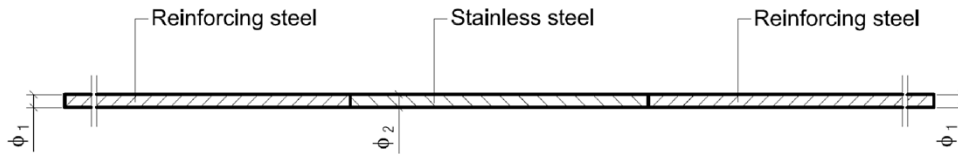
Steel compression element with reinforcing steel welded on both sides
